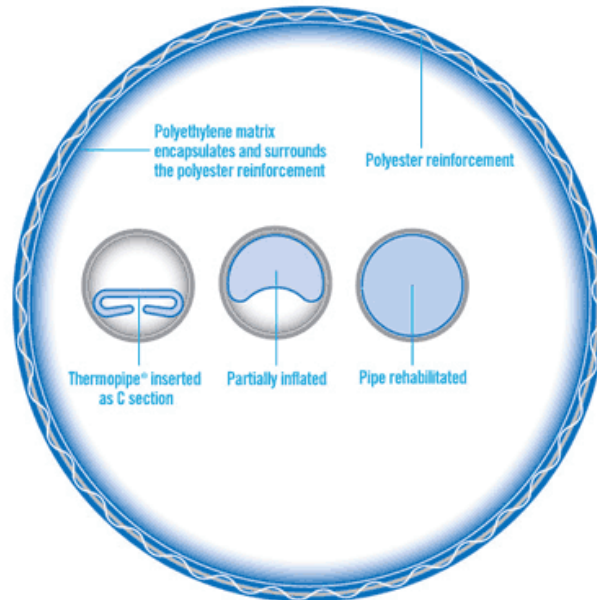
Thermopipe® Cross Section (www.insituform.com)
